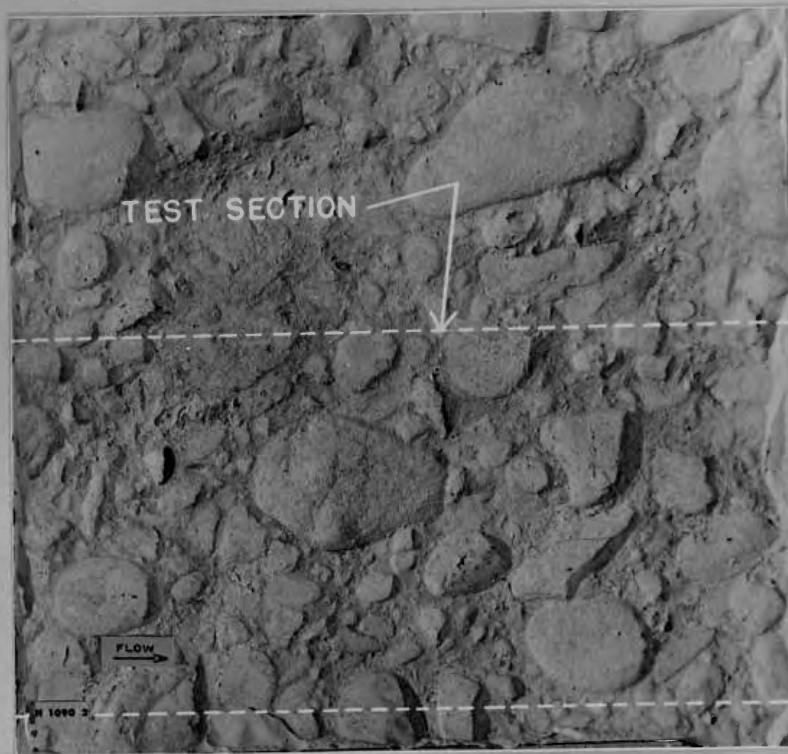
1-foot-square plaster mold of eroded surface at Davis Dam (Specimen No. 2).
